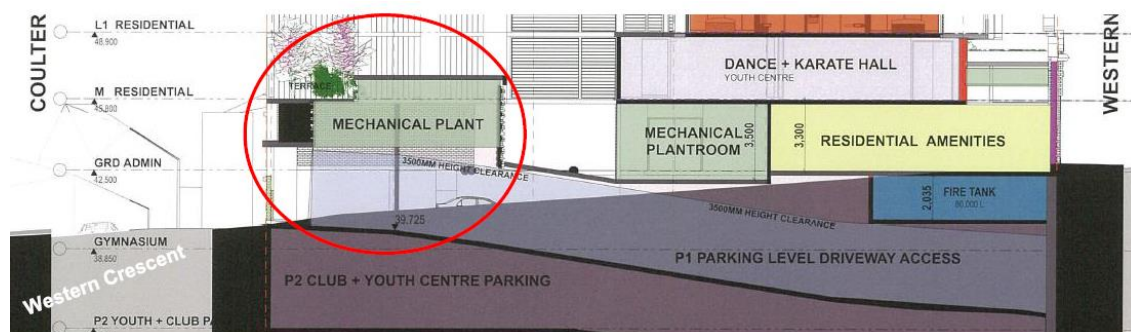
Section through southern elevation showing mechanical plant within P1 Carpark entry roof space.
